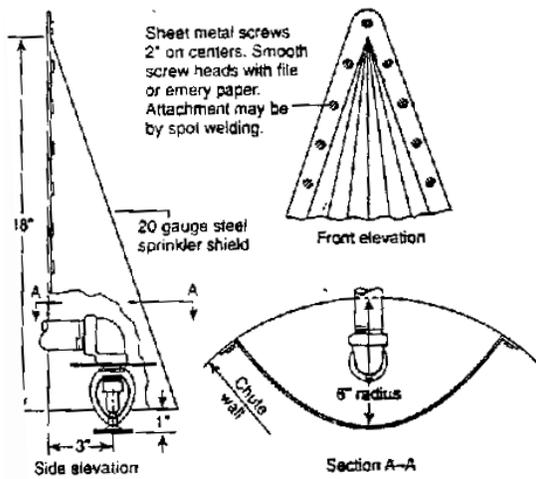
Canopy for protecting sprinklers in building service areas.
